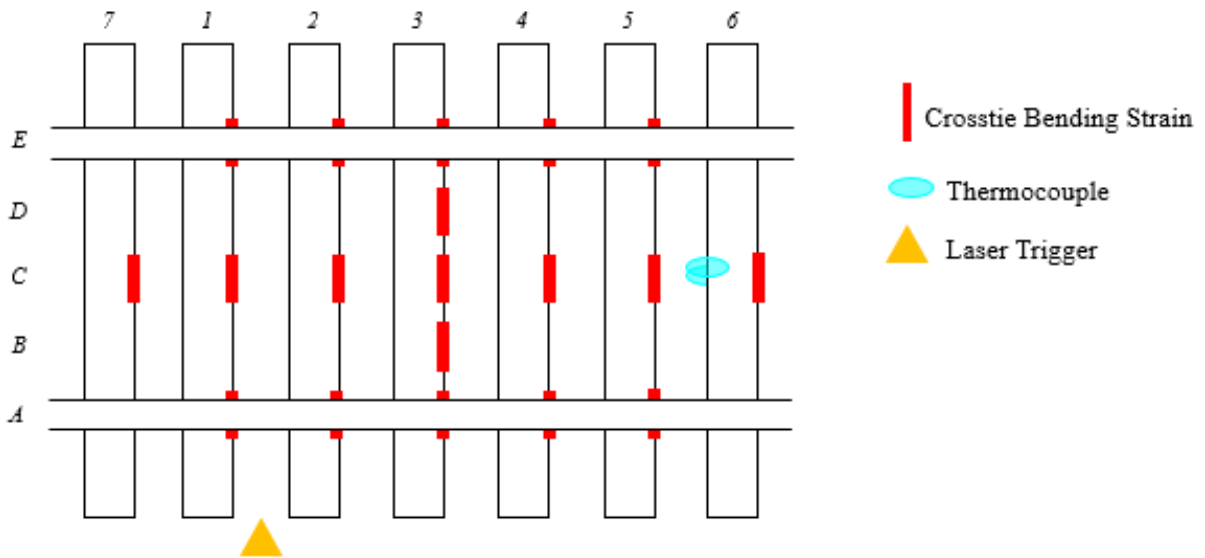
Plan view of instrumented crosstie section on Amtrak's NEC in Edgewood, MD
